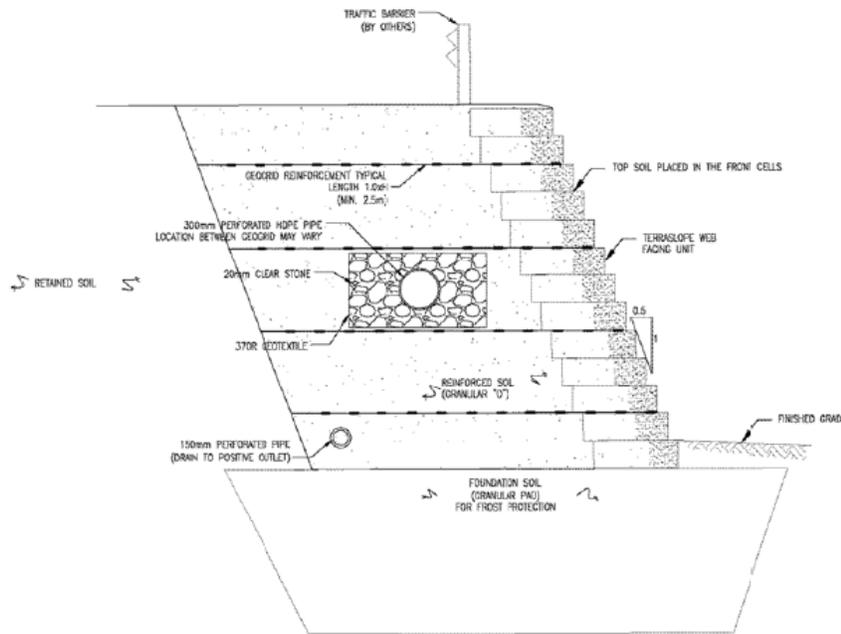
TerraSlope®Web Retaining Wall/Infiltration System
